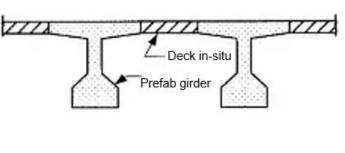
Bridge consisting of T-girders with crossbeam in between [28].
